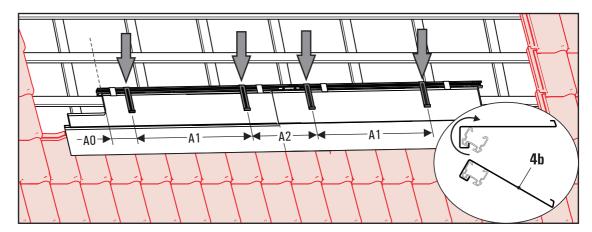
Hang solar panel securing hooks (4b) into the upper side guiding groove of the lower mounting rails and tilt downwards.
